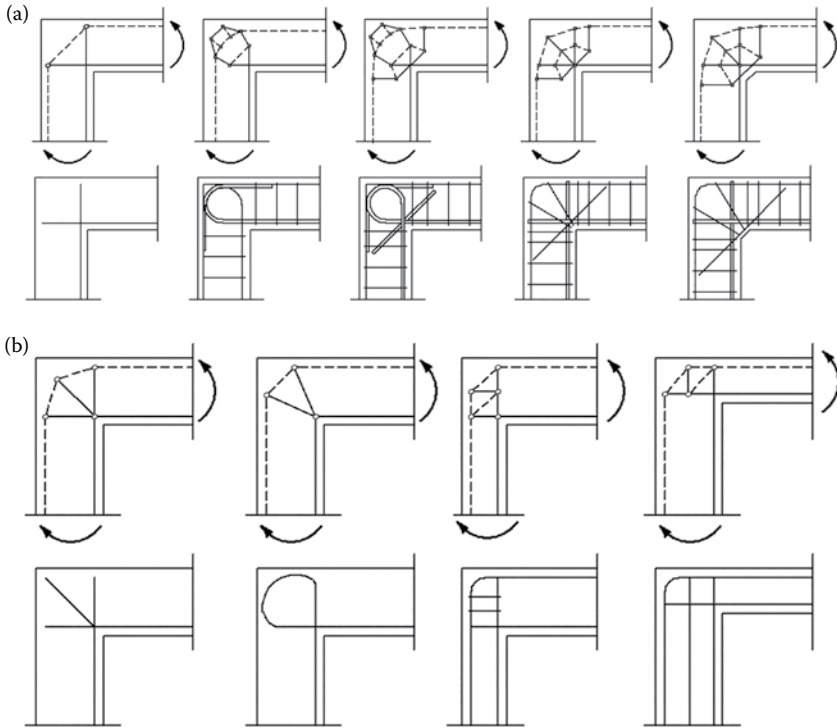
Strut-and-tie modeling of an opening corner joint: (a) models proposed by Schlaich et al. (1987) and (b) additional suggested models.
